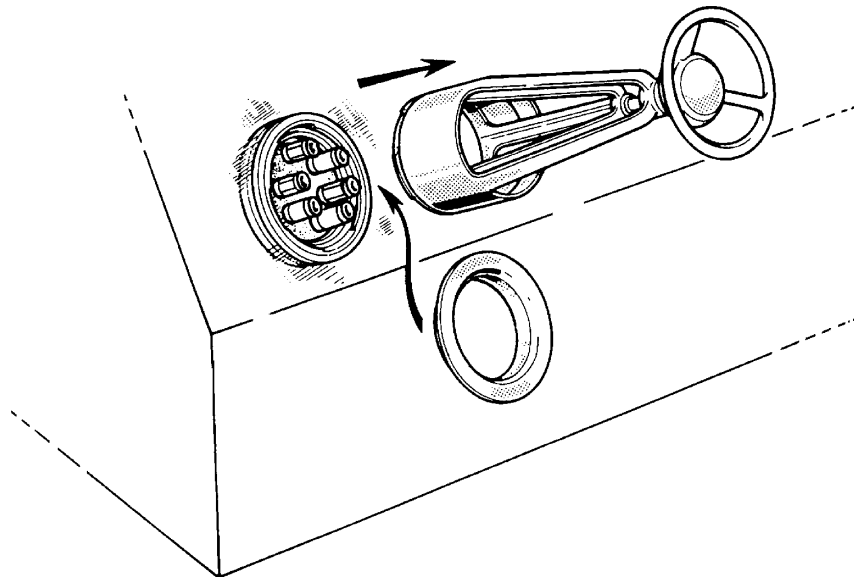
Example of fluid penetration using an ejectable rigid plug
